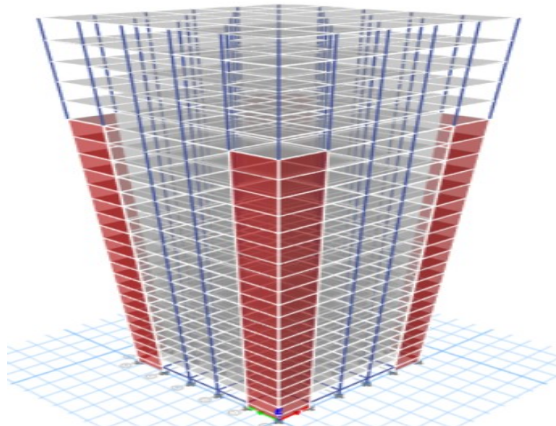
D View of RC framed building with shear wall (From base to 20th story)
